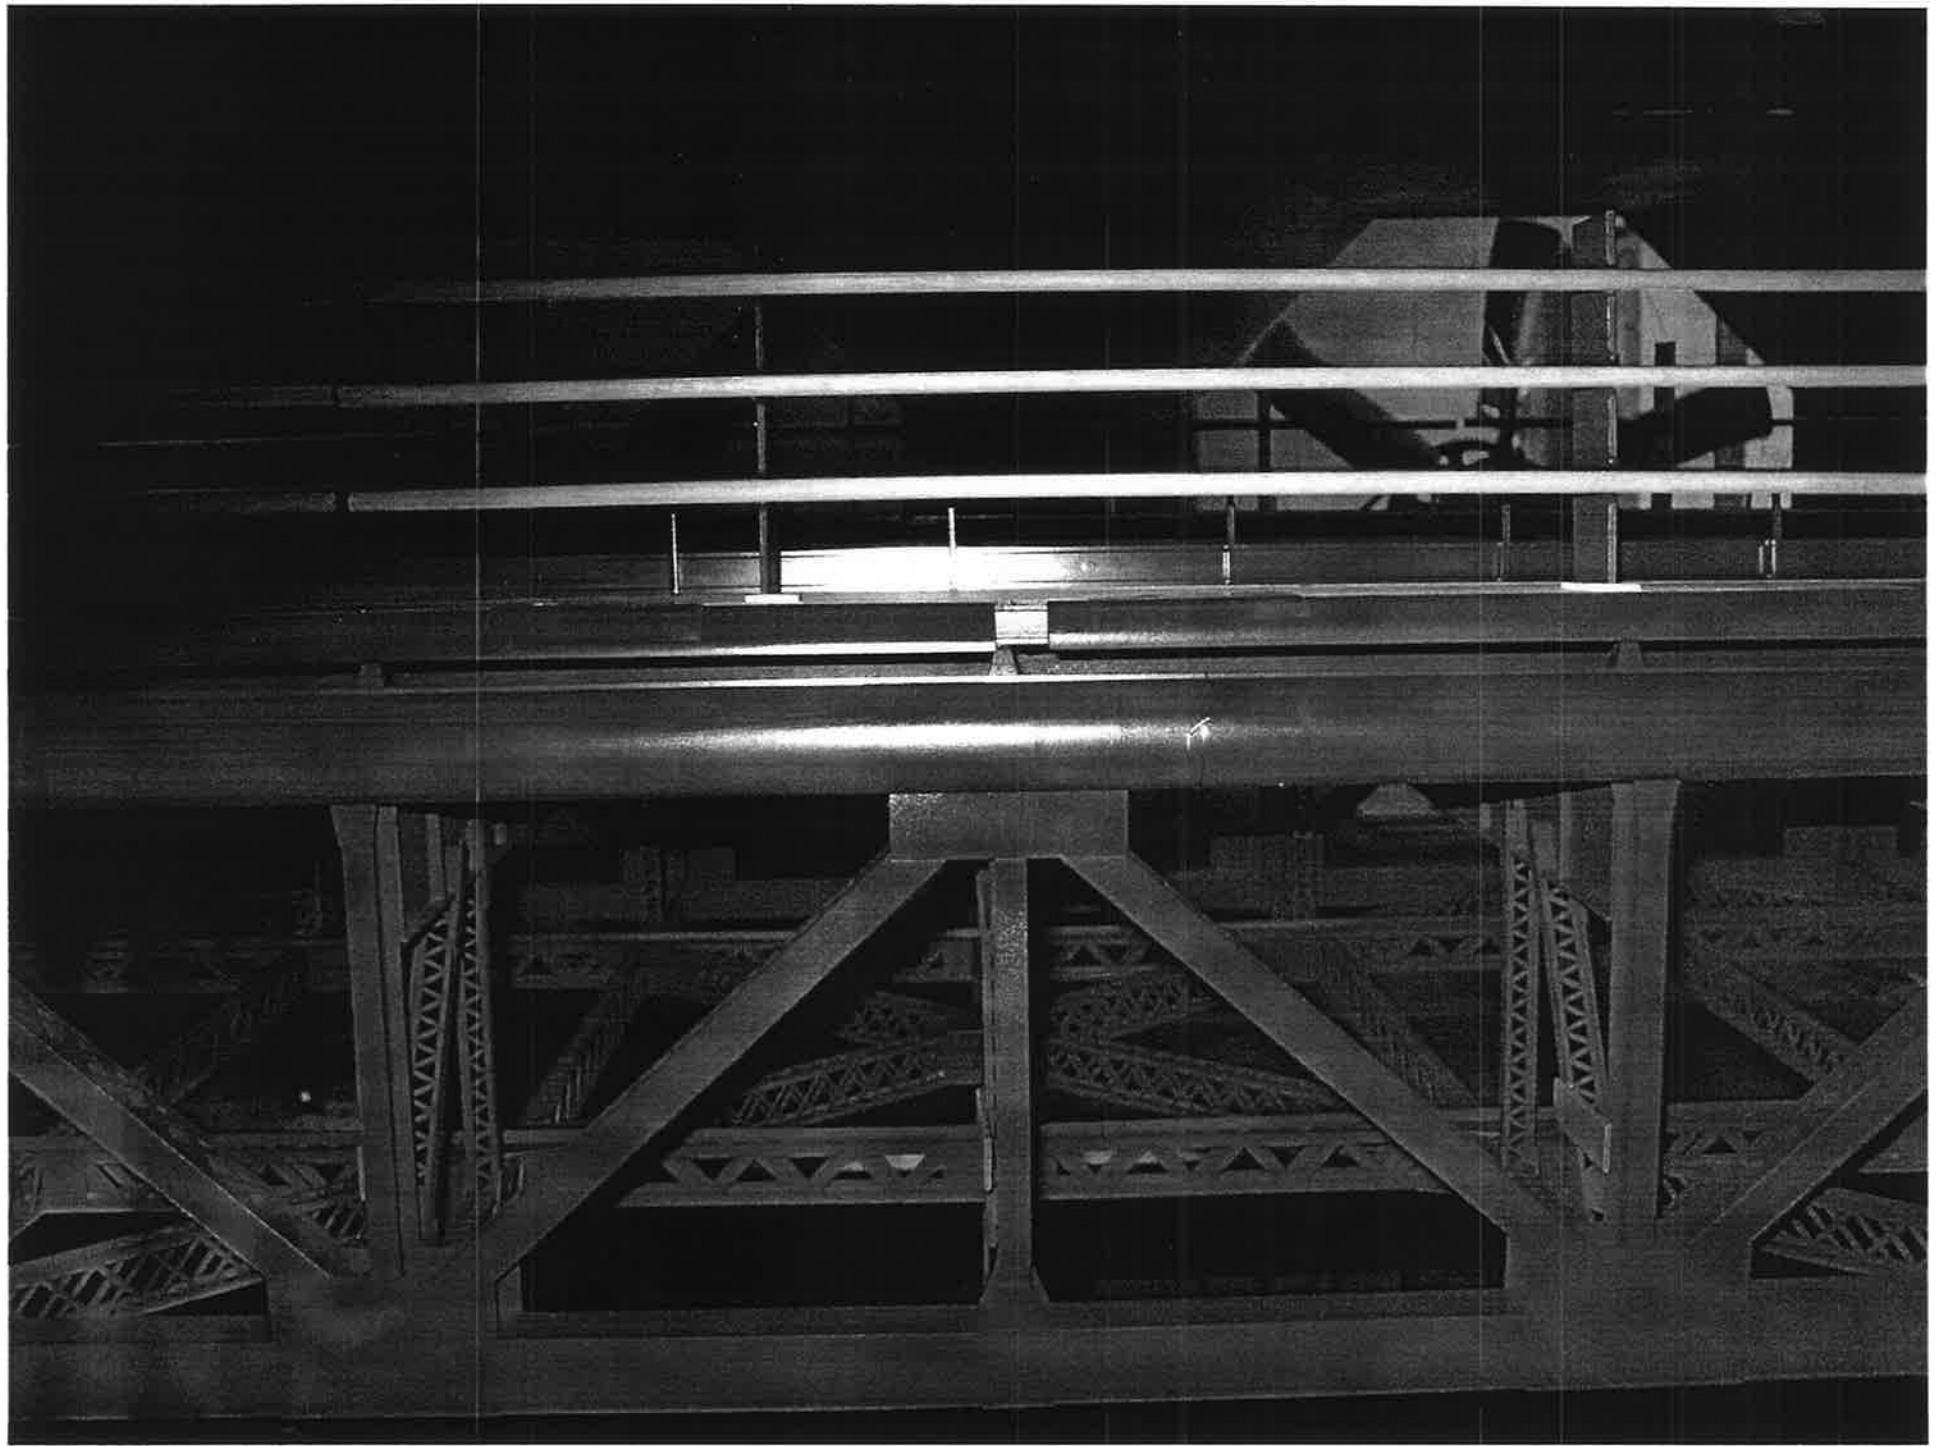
CONCEPT 2 : REPLACING THE EXISTING RAILING; WIND FAIRINGS ON TRUSS
